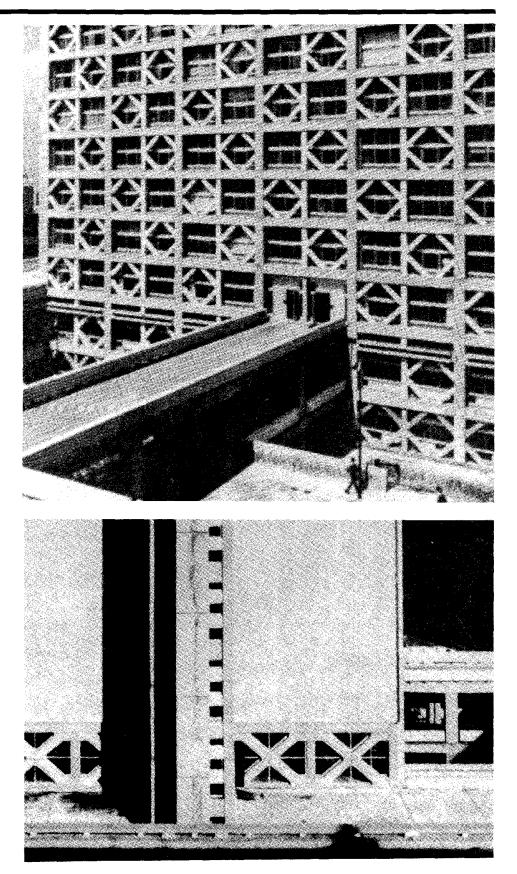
Inset checkerboard bracing, and braced, open, first floor. Physics and Engineering Building, Waseda University School of Science & Engineering, Tokyo, Japan. Katsuo Ando and his staff, architects.
